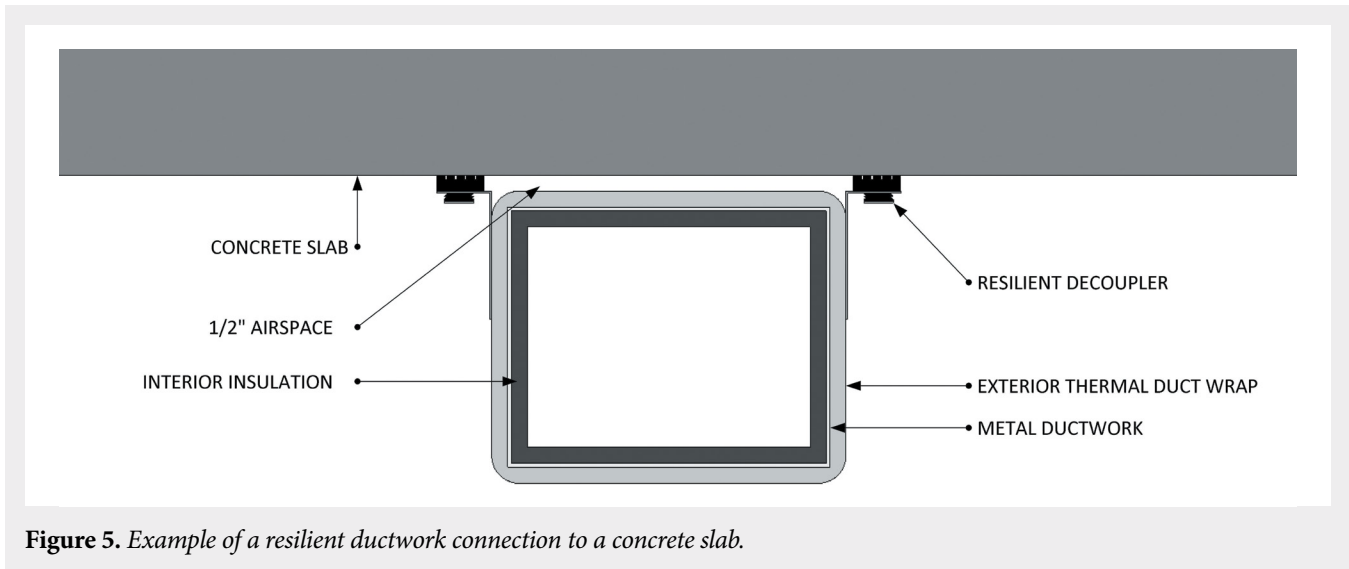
Example of a resilient ductwork connection to a concrete slab.
